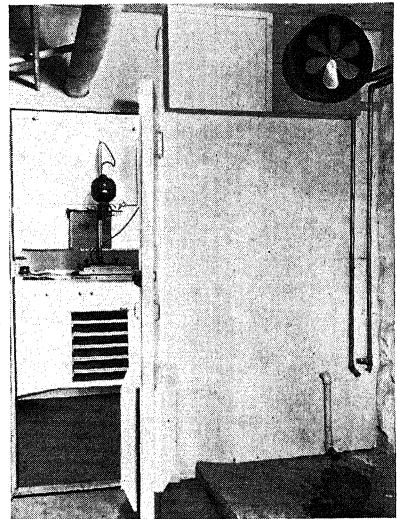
Outside of Mr. Davis' photographic laboratory showing position of exhaust fan. Note light trap ventilator on door
